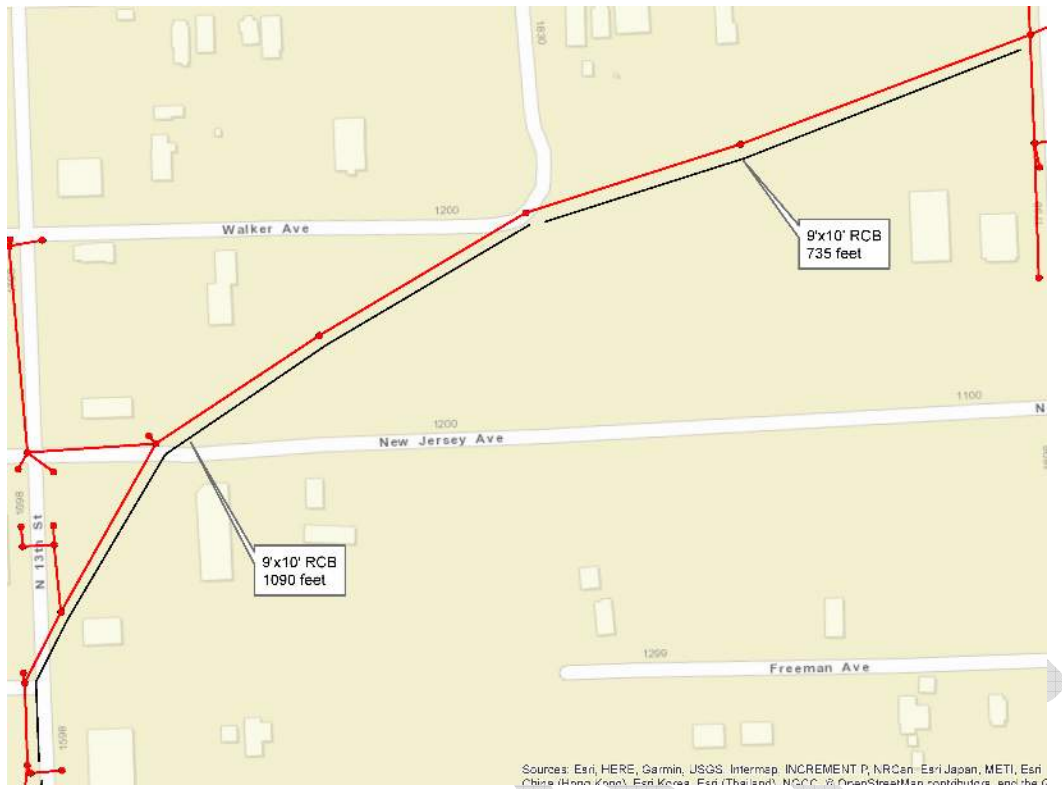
Proposed Improvements to JERS 2 central conduit.
